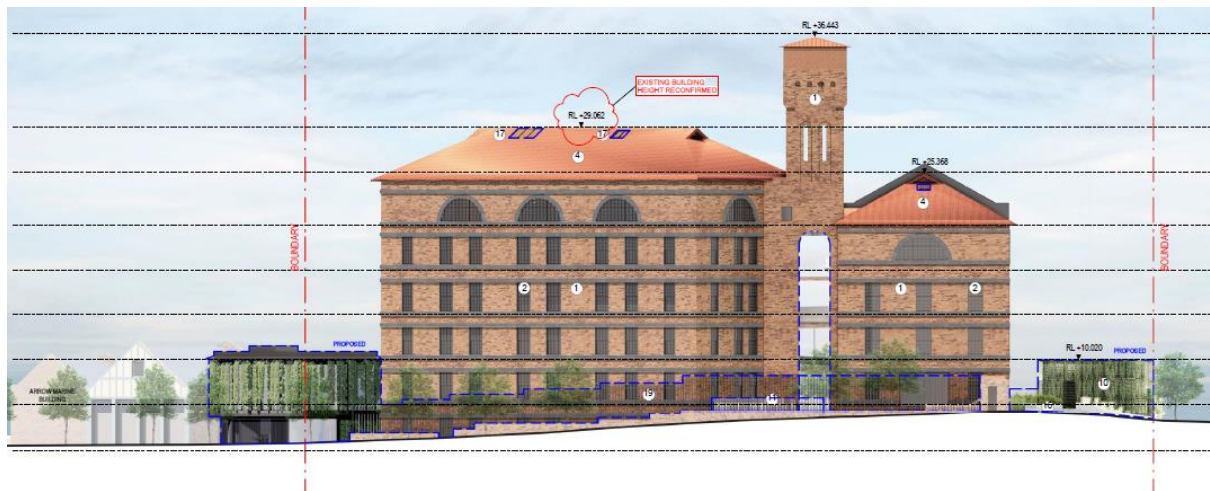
Proposed south elevation, including proposed works to Building D (D/2021/1507)
